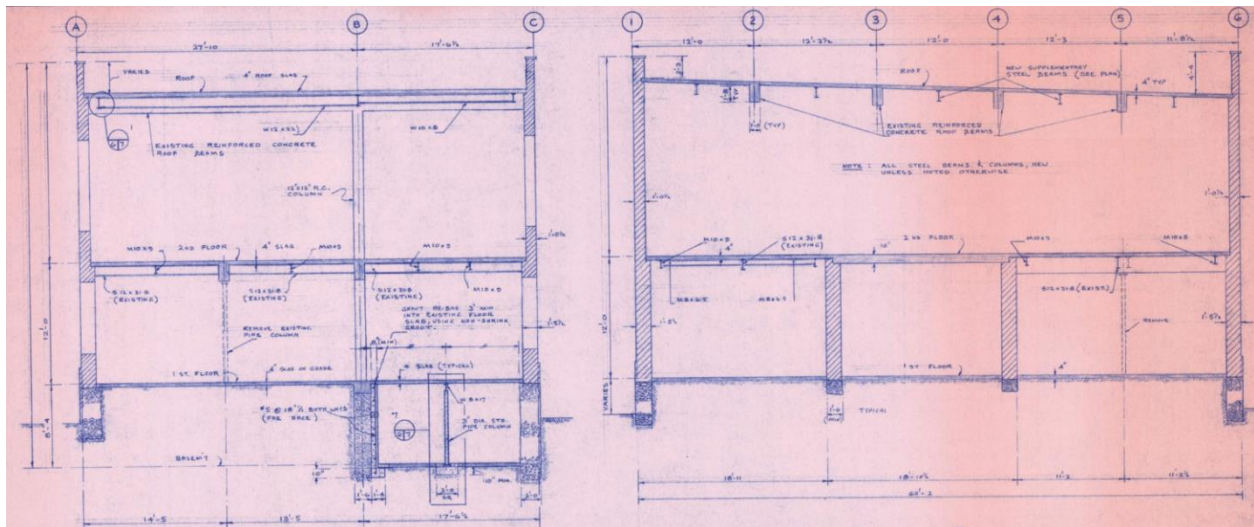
Building section of the original 1906 era courthouse building looking north (left) and looking west (right) from Sheet S-6 from the 1982 remodel drawings.
